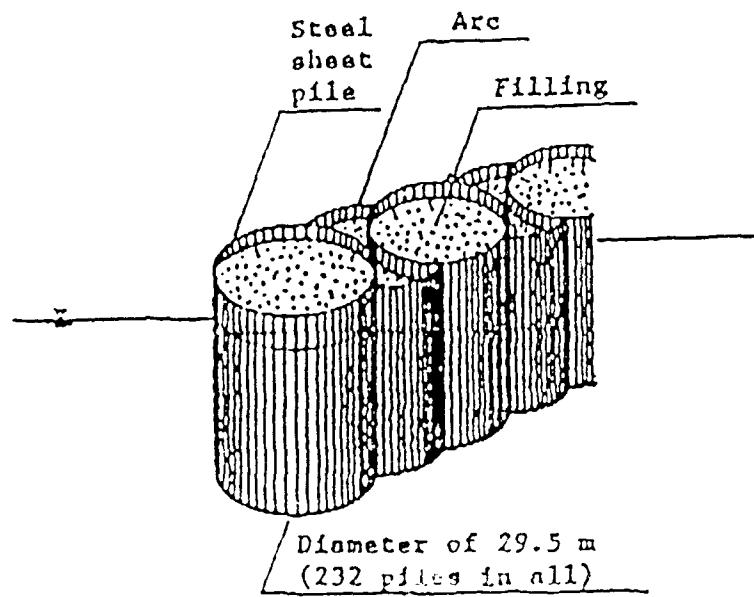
Installation and the standard design section of steel sheet pile cellular structure
